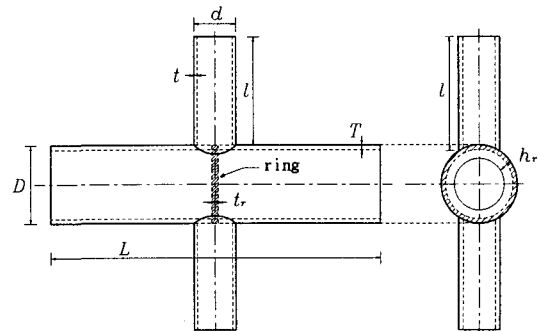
Dimensions of internally ring stiffened tubular X-joint.
